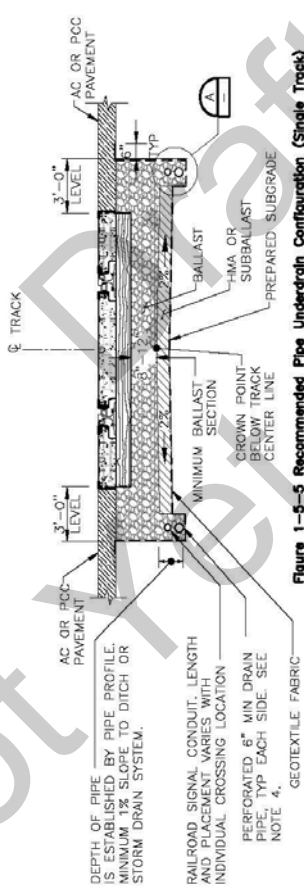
Recommended Pipe Underdrain Configuration (Single Track)
